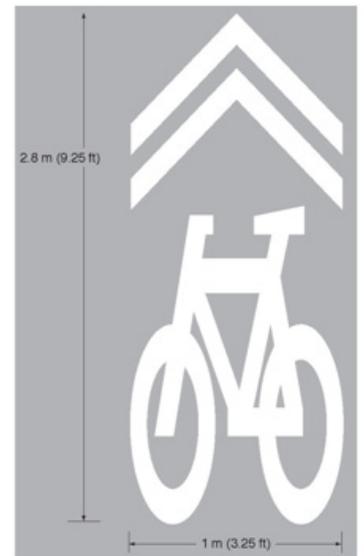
Typical Pavement Marking on Designated Shared Road
